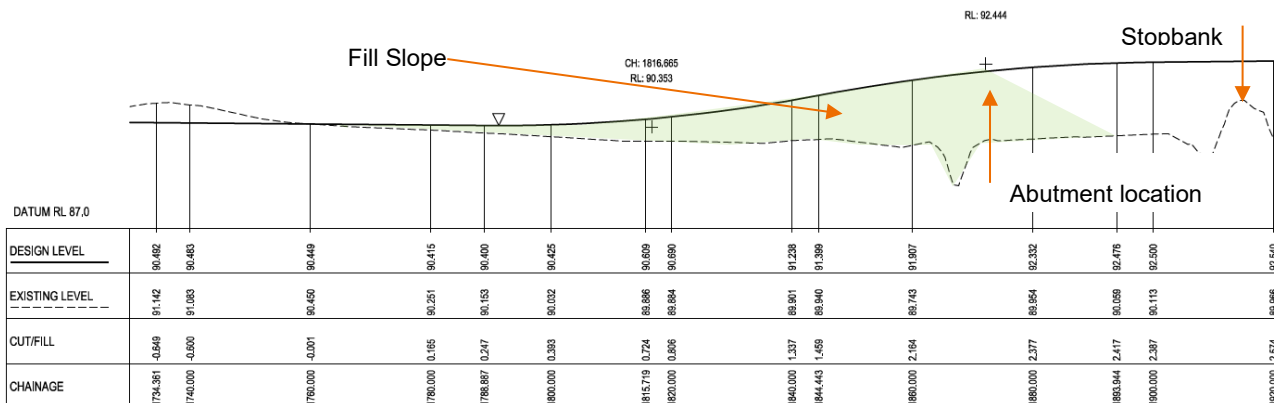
Preliminary longitudinal section showing at northern abutment (Ashburton)
